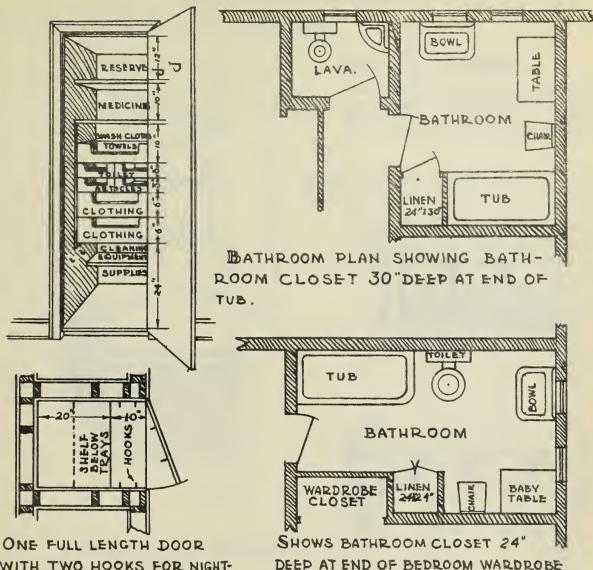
PLATE III - BATHROOM STORAGE FACILITIES CLOSETS PLAN A
